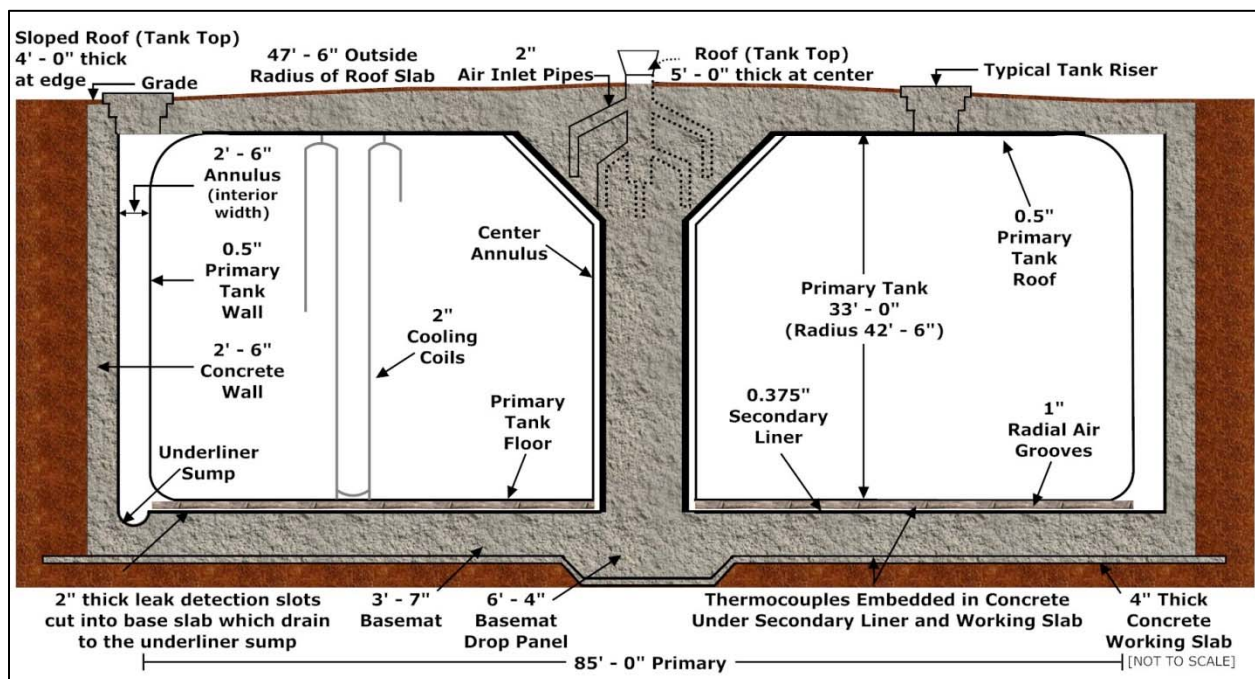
Typical Type IIIA Tank Cross-Section
